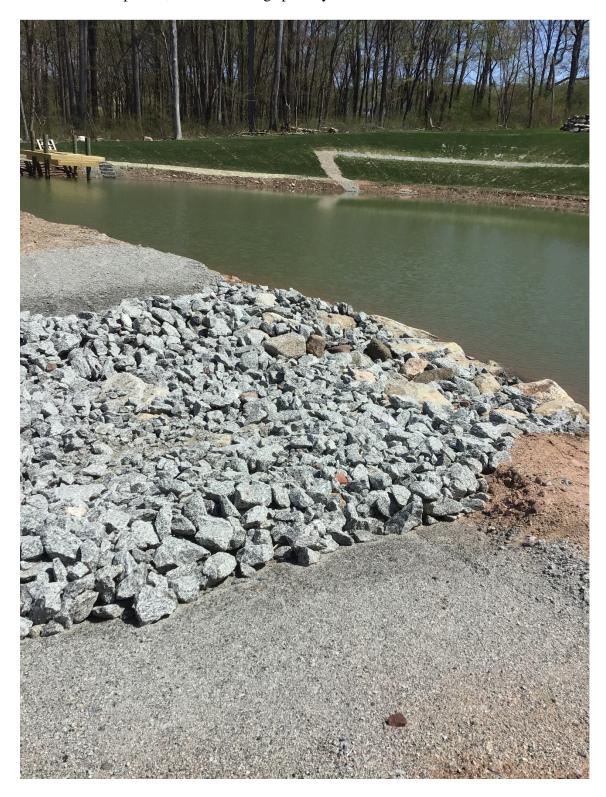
taken April 21, 2023: Existing stone lined watercourse, connected to existing spillway.
